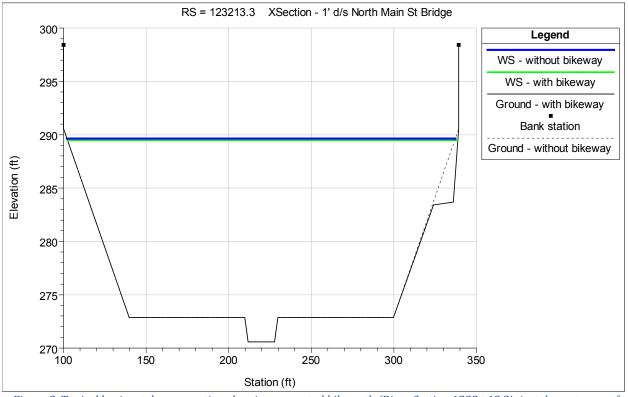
Typical horizontal cross-section showing excavated bike path (River Station 1232+13.3), just downstream of Main Street
